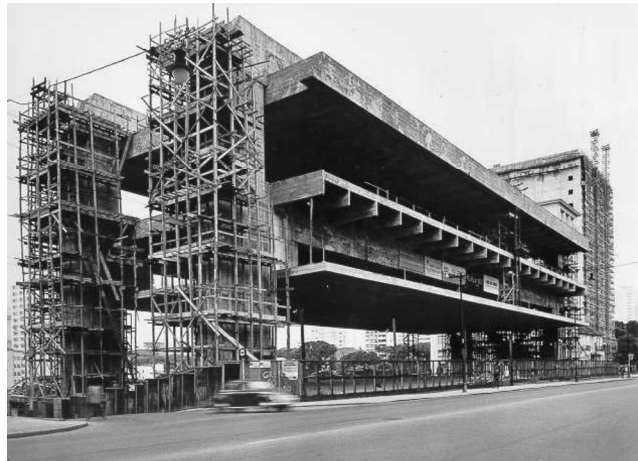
Construction of the MASP at Avenida Paulista (MASP collection), (1958-1968). Source: <https://www.archdaily.com.br/br/772263/fotografando-a-obra-de-lina-bo-bardi-parte-3>.
